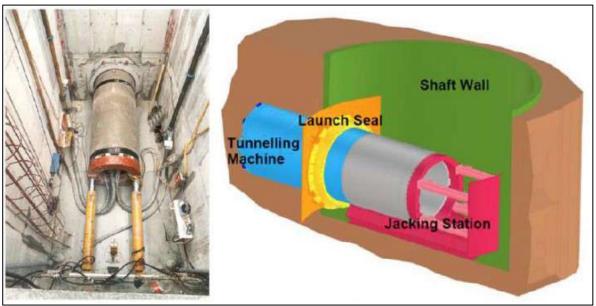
Example of thrust shaft and pipe jacking system for constructing pipeline tunnels (PRDW, 2016).
